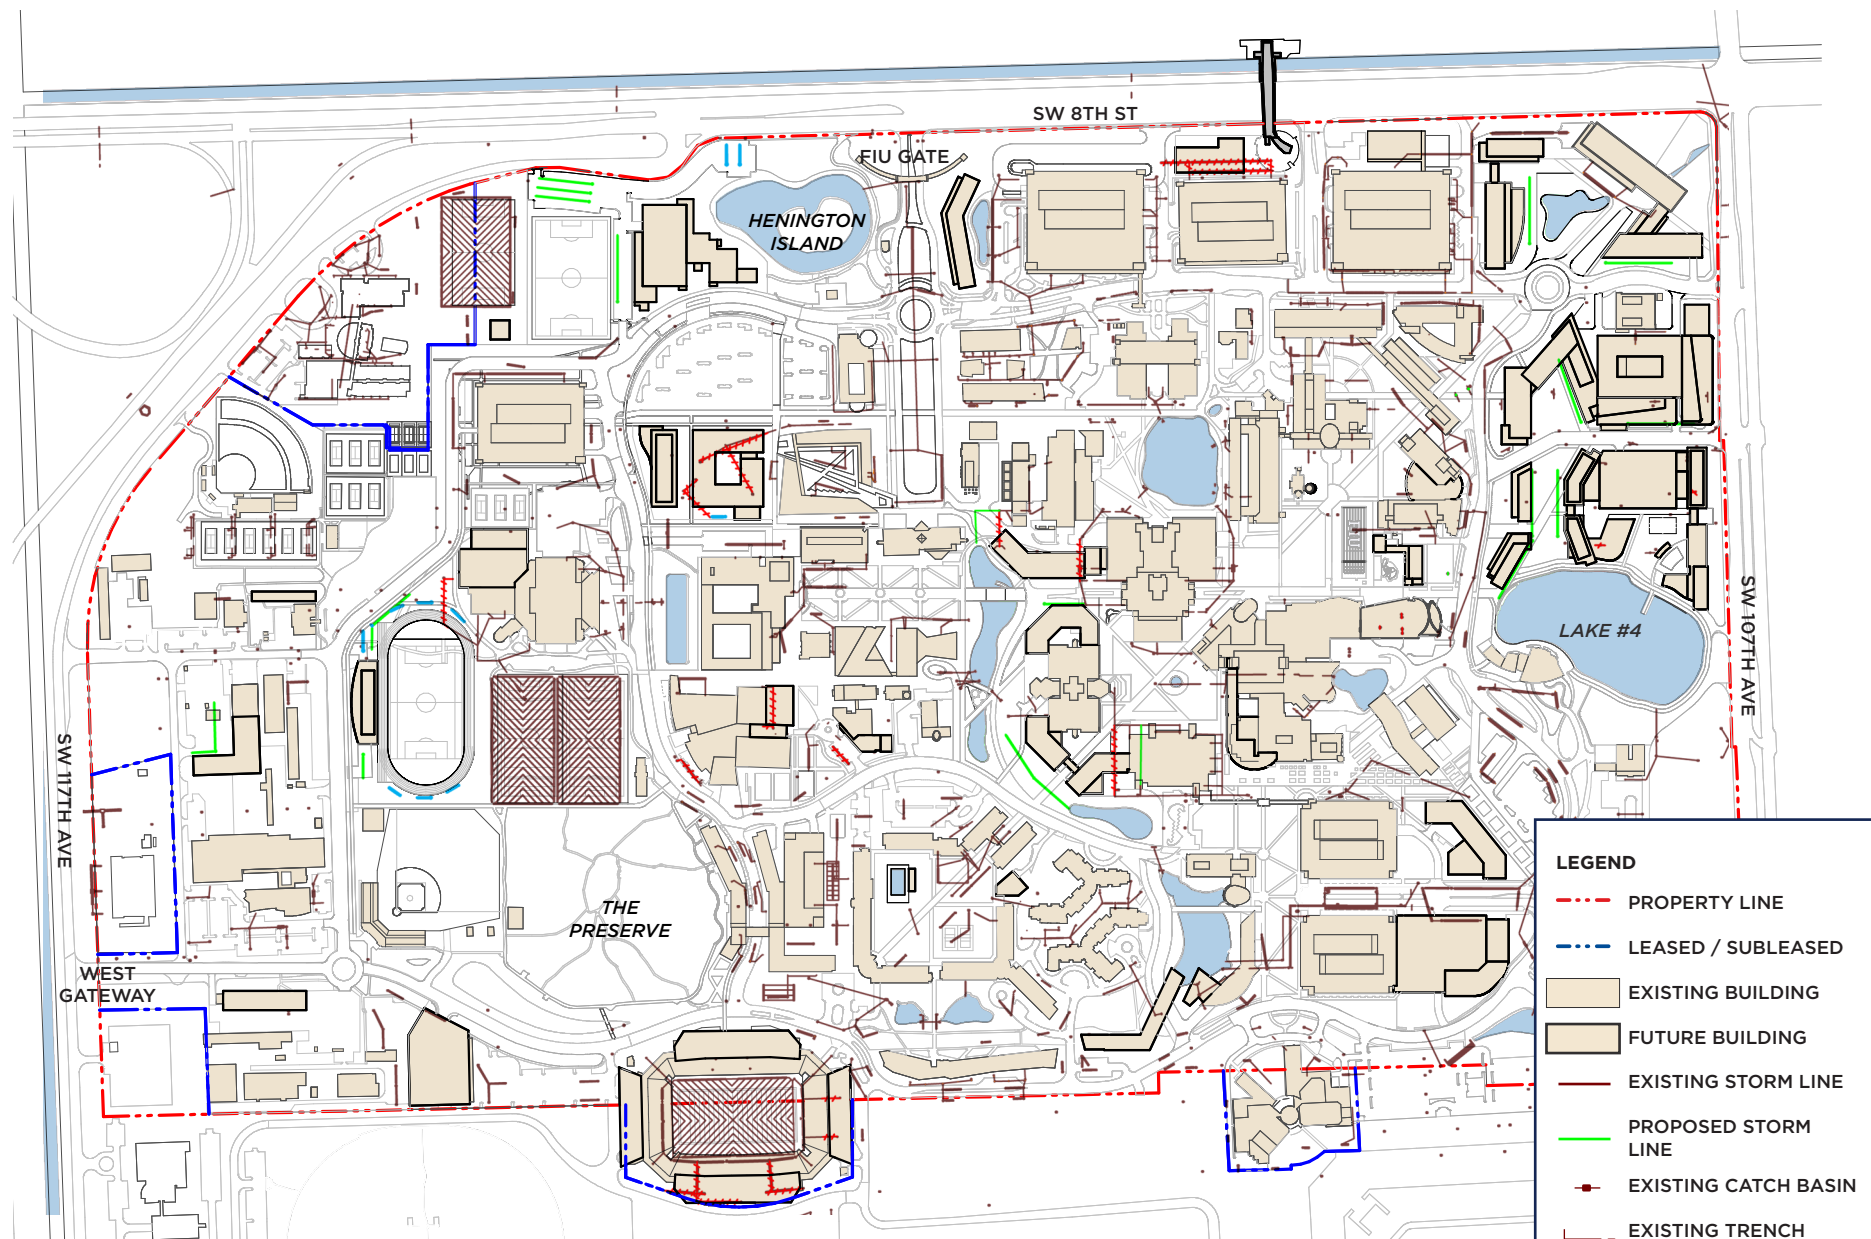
MMC 2035 PLAN - DRAINAGE
